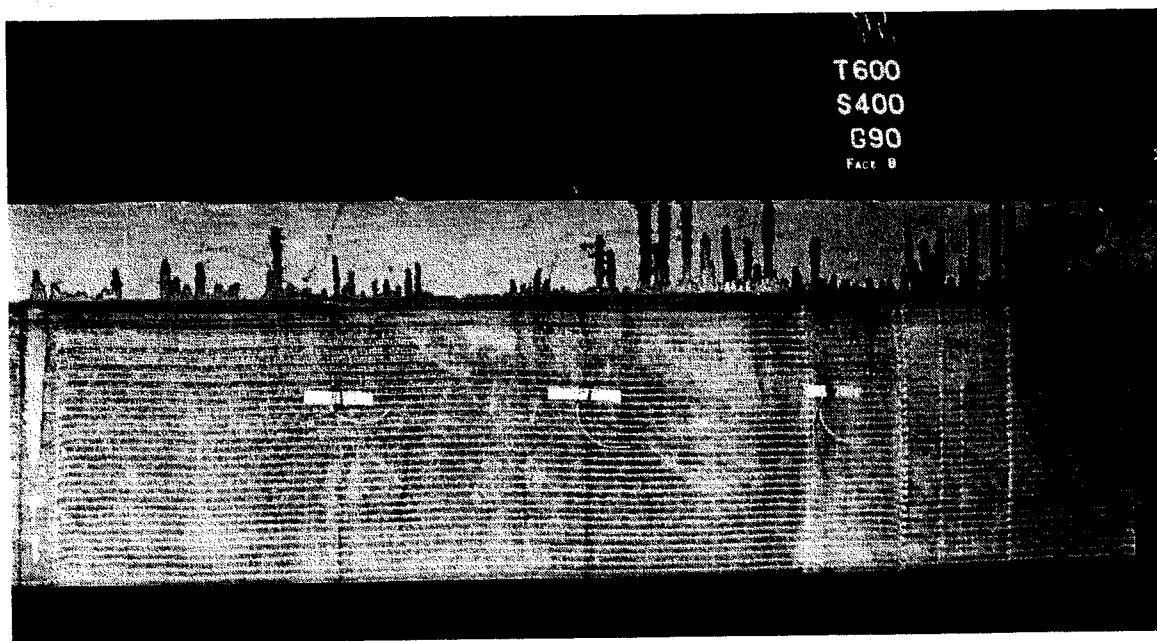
T6S4G90 Specimen after Failure (Face B)
